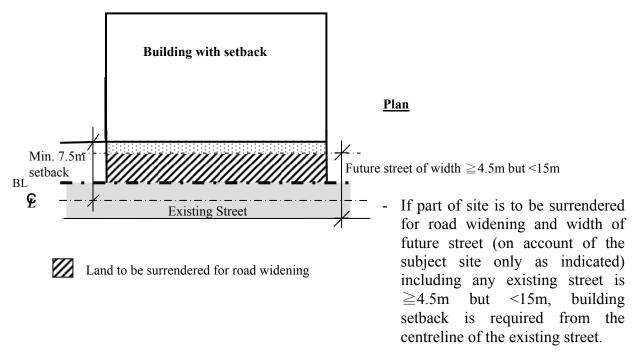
Example (2) of Building Setback – Portion of Site will be surrendered to form a future street
